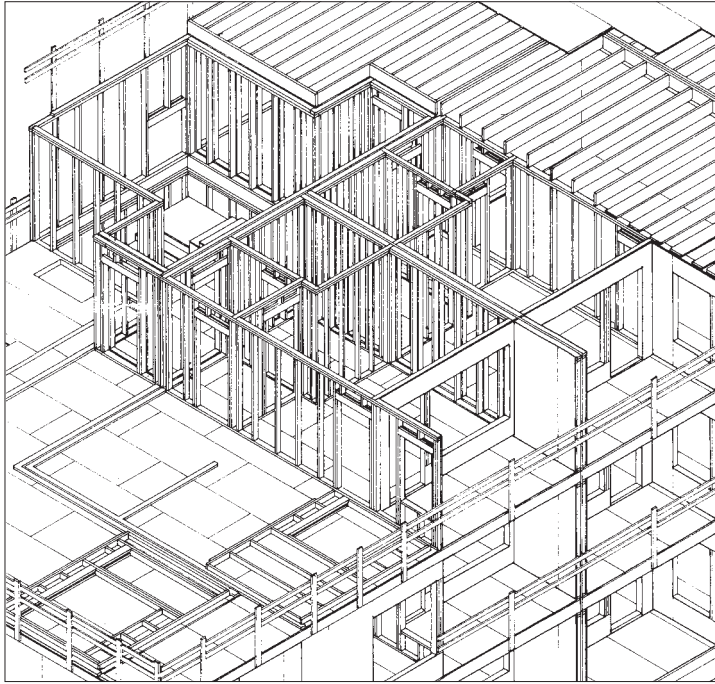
a and b. Walls are assembled horizontally on an erection platform. Alternatively wall frames can be delivered to site as ready assembled framing elements that consist of both load-bearing and bracing structure, whilst framing components and structural model solutions remain the same as in the in-situ building process.
